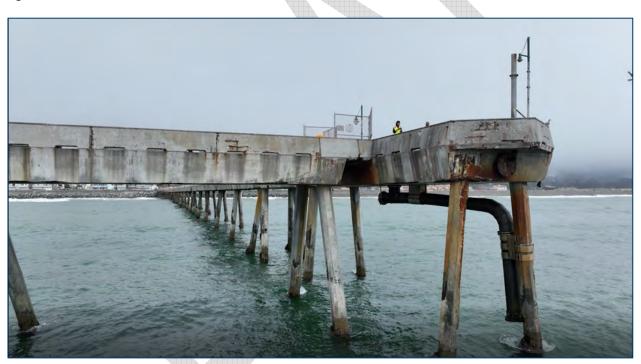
Deck Exterior around Bent 2 and 1R – West Face
